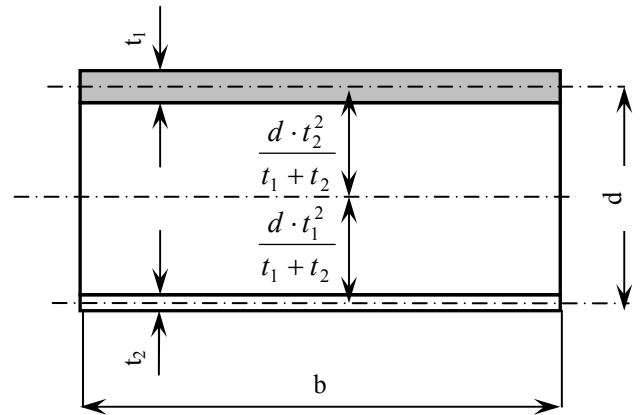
Dimensions in a cross section of an open sandwich beam with dissimilar skins
